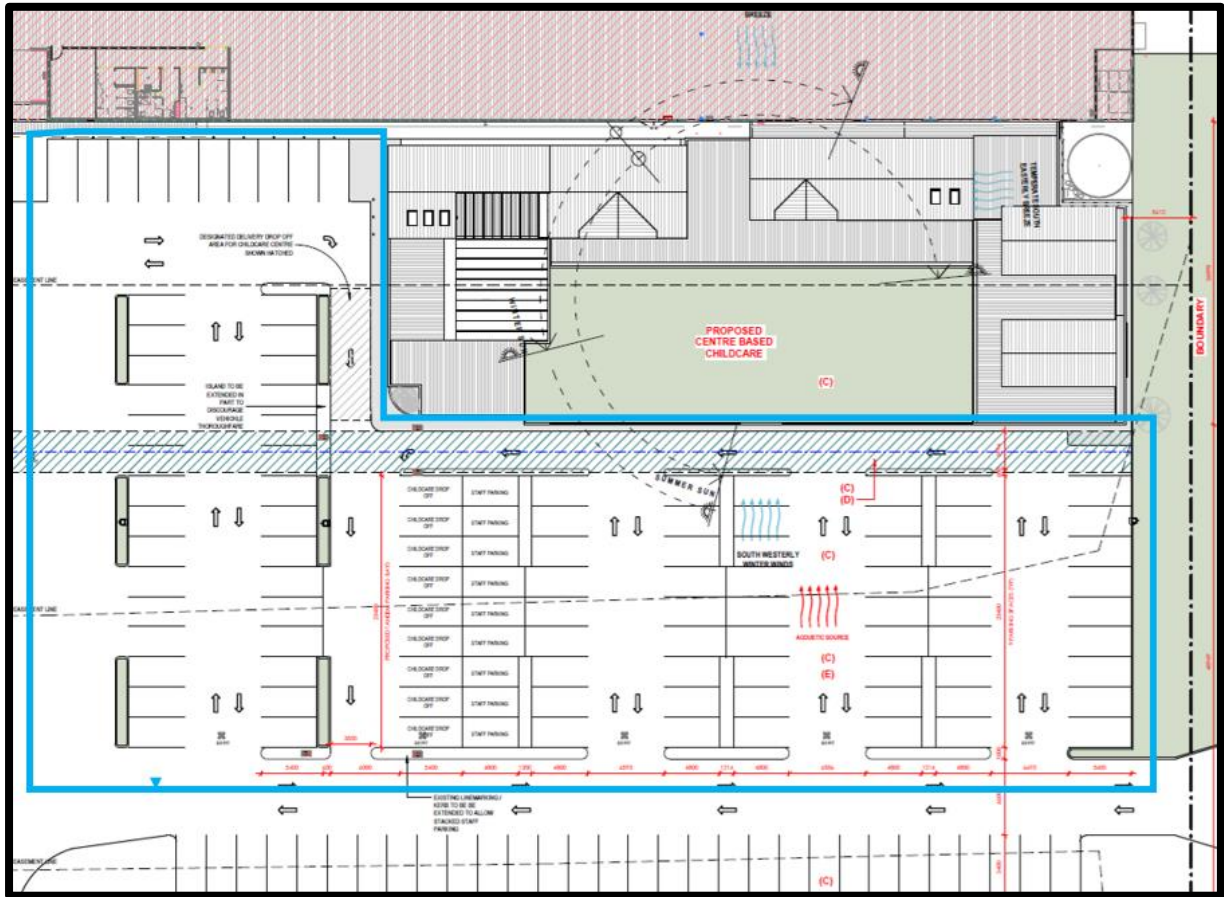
Approved car-parking layout (Source: 5 Canons Architecture, 2021)
